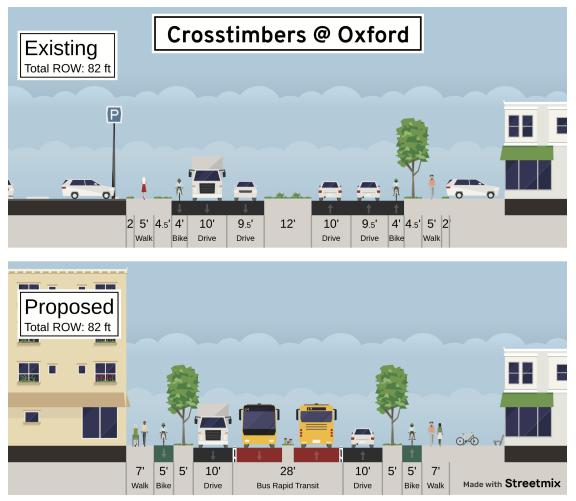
Crosstimbers St at Oxford St in Independence Heights. Above: the existing street has sidewalks, low-comfort bike lanes, and four general-purpose lanes. Below: our proposed street has sidewalks, high-comfort bike lanes, two general-purpose lanes, and bi-directional bus rapid transit.
